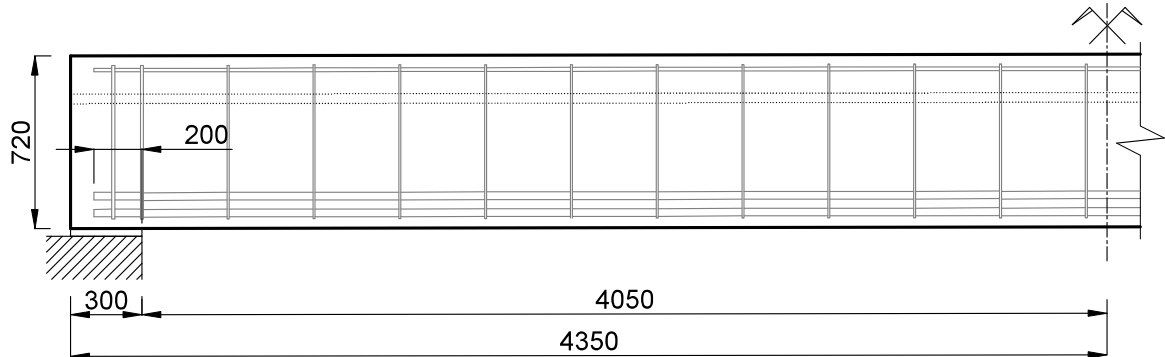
T-beam reinforcement detail – long section (symmetry applies): beam with short end anchorage length for main reinforcement bars [mm].
